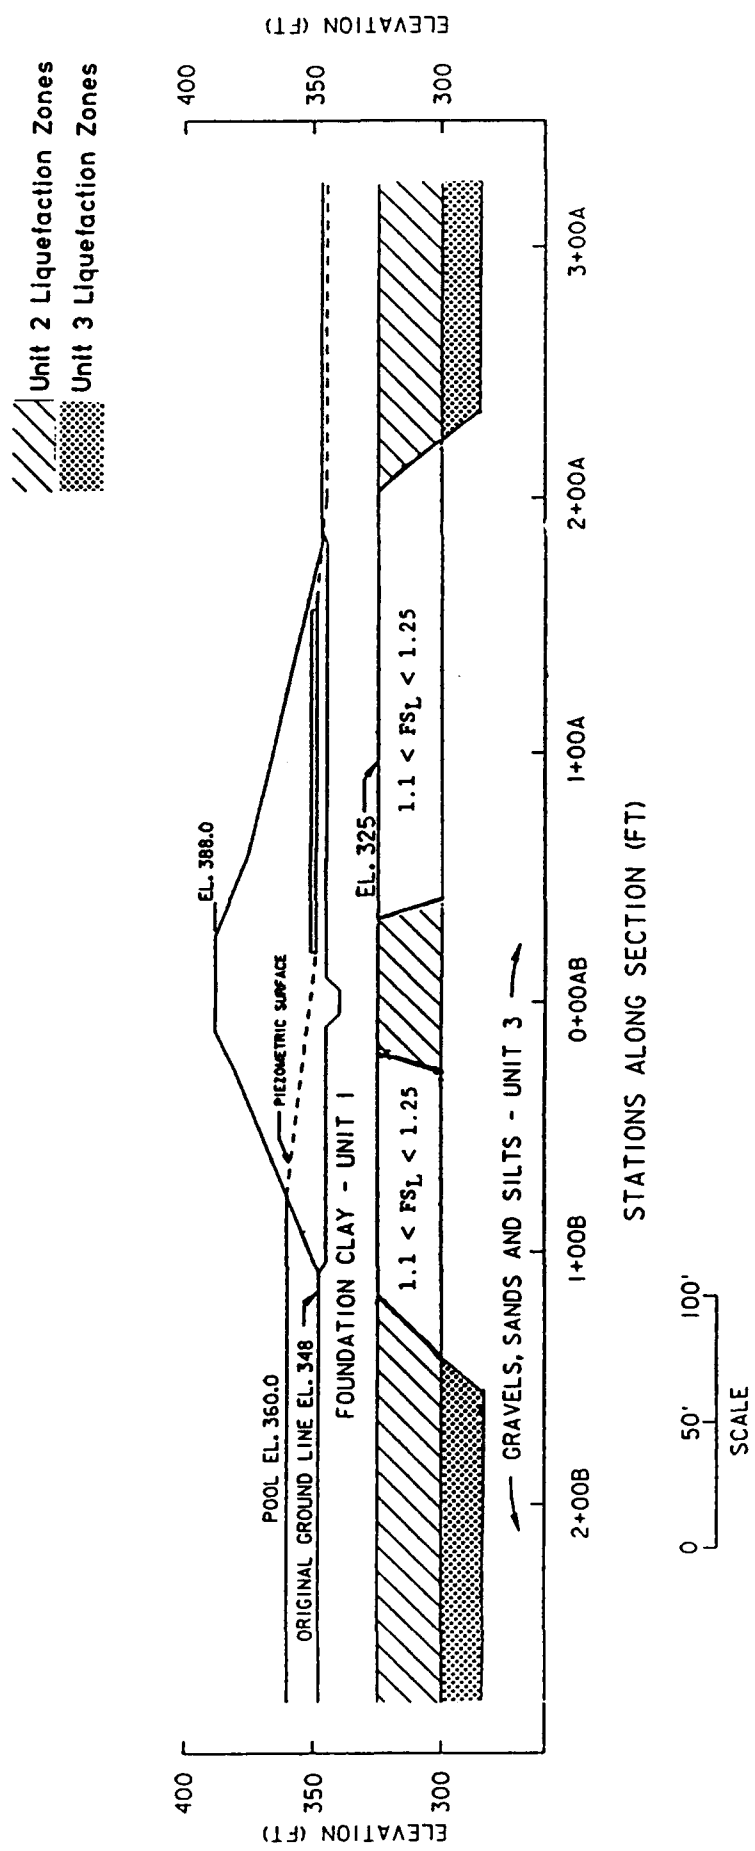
Interpreted zones of liquefaction in the foundation beneath the main embankment.
